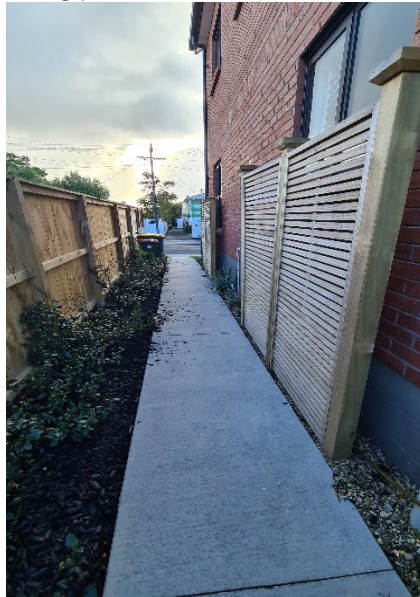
Landscaped buffer providing privacy to windows overlooking a shared pedestrian accessway
